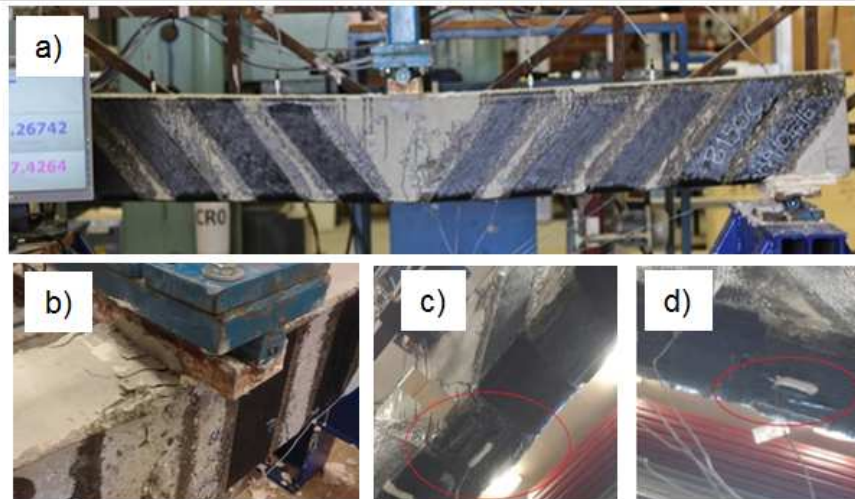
(a) Failure mode of Beam B150C; (b) Compressive failure of concrete at loading plate; (c) Complete BFRP rupture at mid-span; (d) Partial BFRP rupture at SGE3
